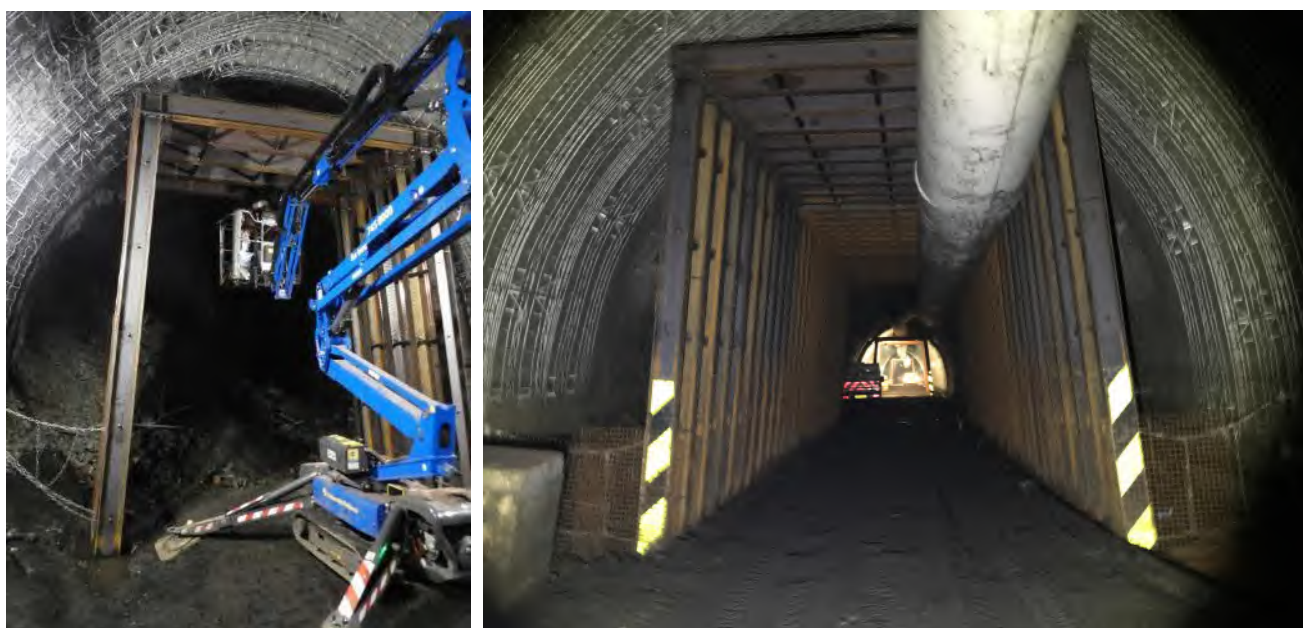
Colliery Arches Being Installed at Queensbury Tunnel
